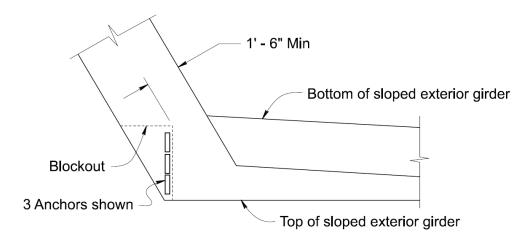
Plan View of Skewed End Diaphragm with Sloped Exterior Girder
